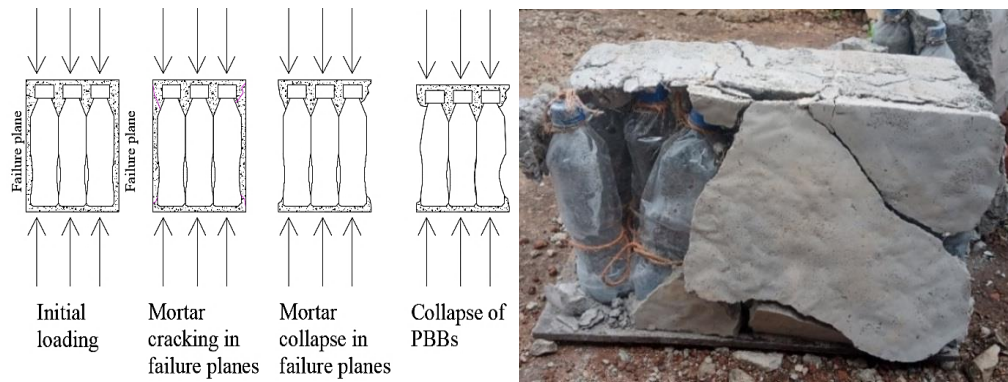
Loading of masonry units in the vertical orientation till failure/collapse.
